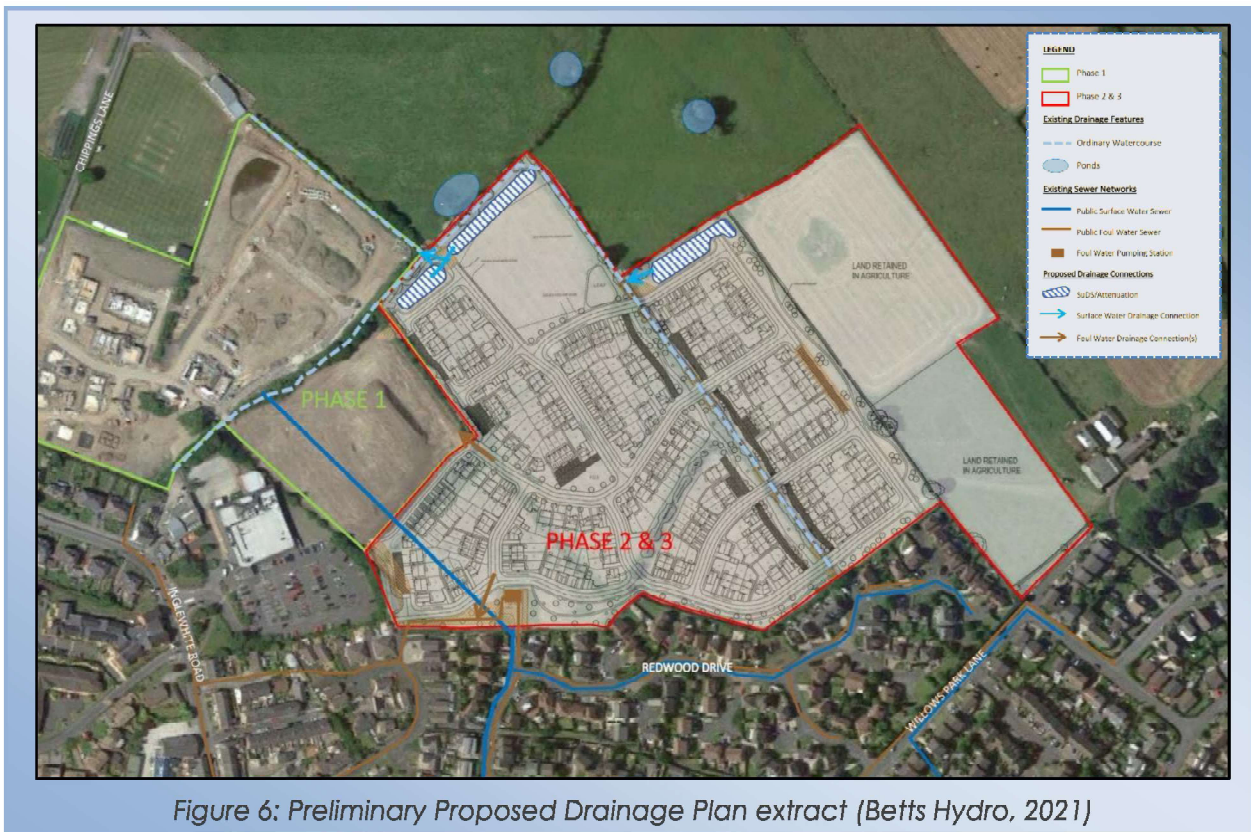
Preliminary Proposed Drainage Plan extract (Betts Hydro, 2021)
